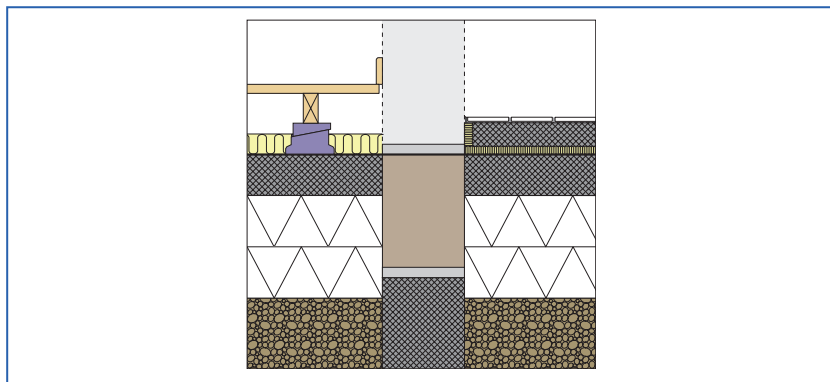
Example of Danish heavy solid wall construction for new terraced housing fulfilling the Danish Building Regulations 2010. [[2] - (Denmark)].
